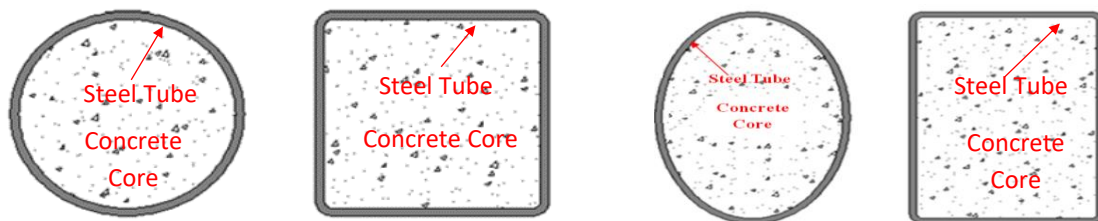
Concrete Filled Steel Tube column (CFST) [55]
